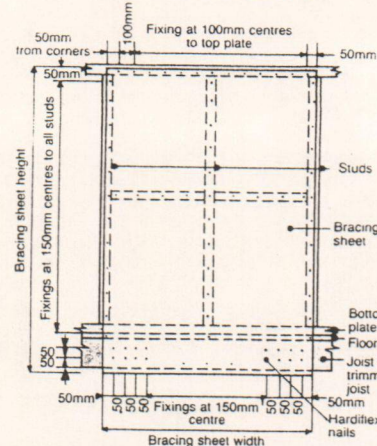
Harditex to Timber or Concrete Floors with End Straps
